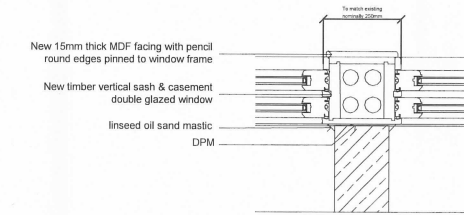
Plan at Jamb During Removal/ Reinstatement 1:10
